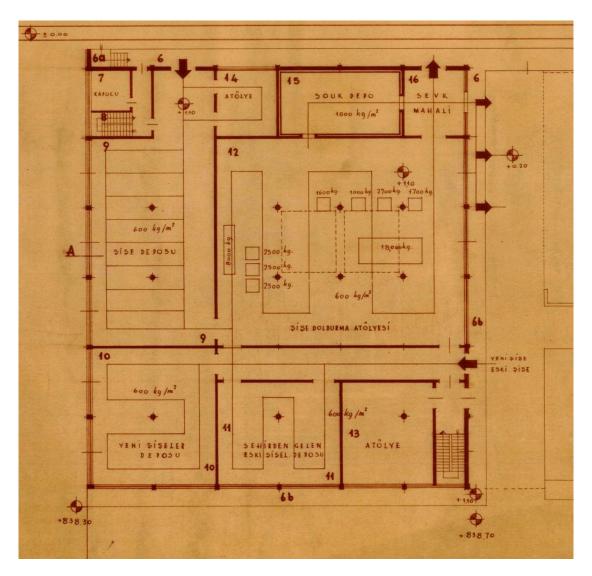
Original drawing of the beer filling building, ground floor plan, Ernst Egli, 1937 (Source: TTA Archive)
